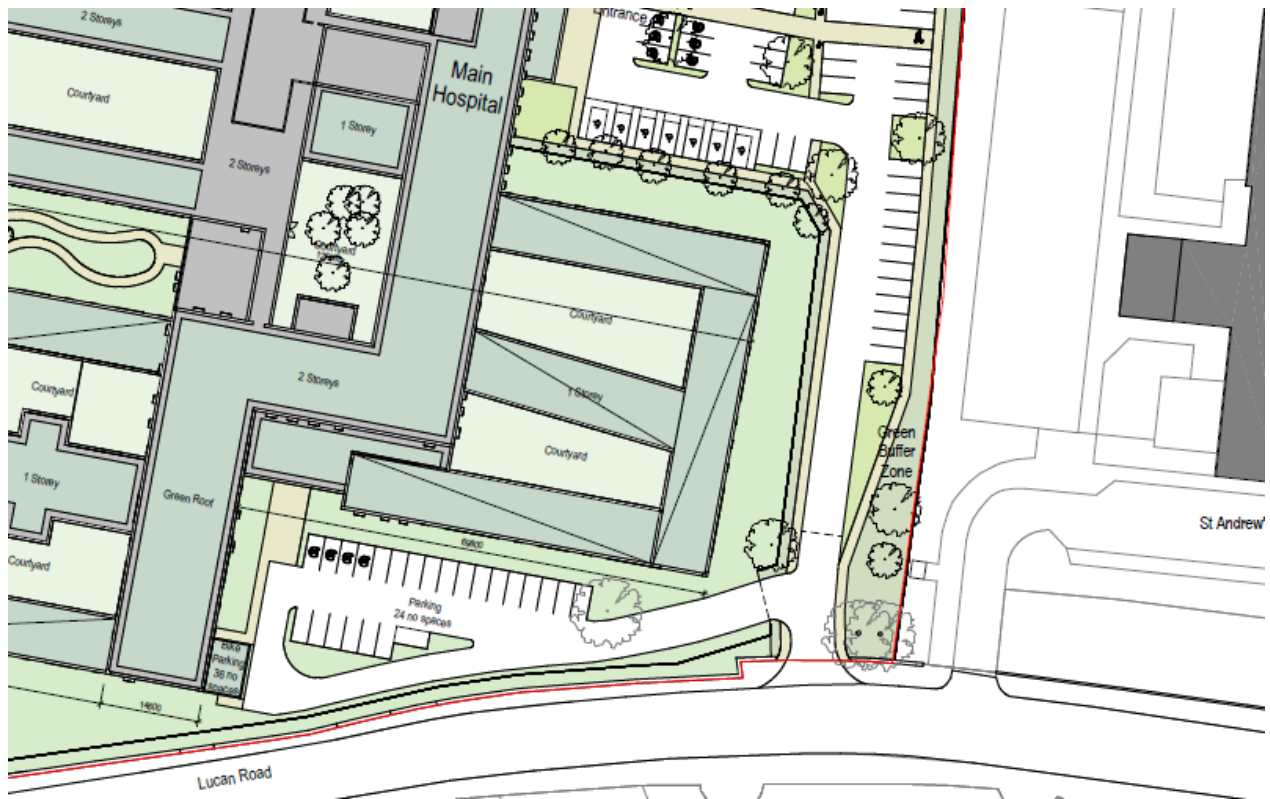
Proposed site plan excerpt showing area where the East wall of the Walled Garden will be removed. Source: TOT Architects
